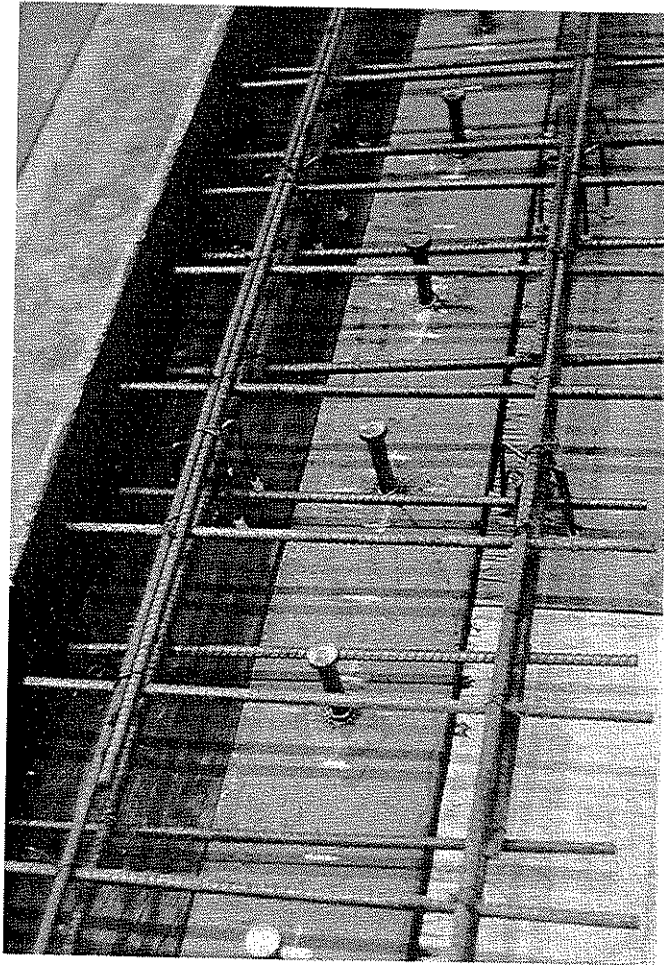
Composite beam specimen: Welded studs (Specimen 4).
